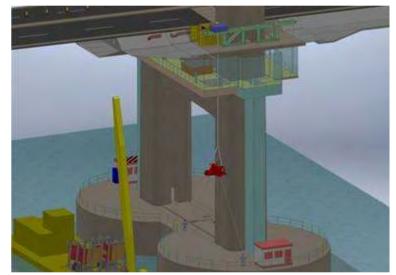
Spencer Proposal - Access To Under Deck Of Humber Bridge UK.
